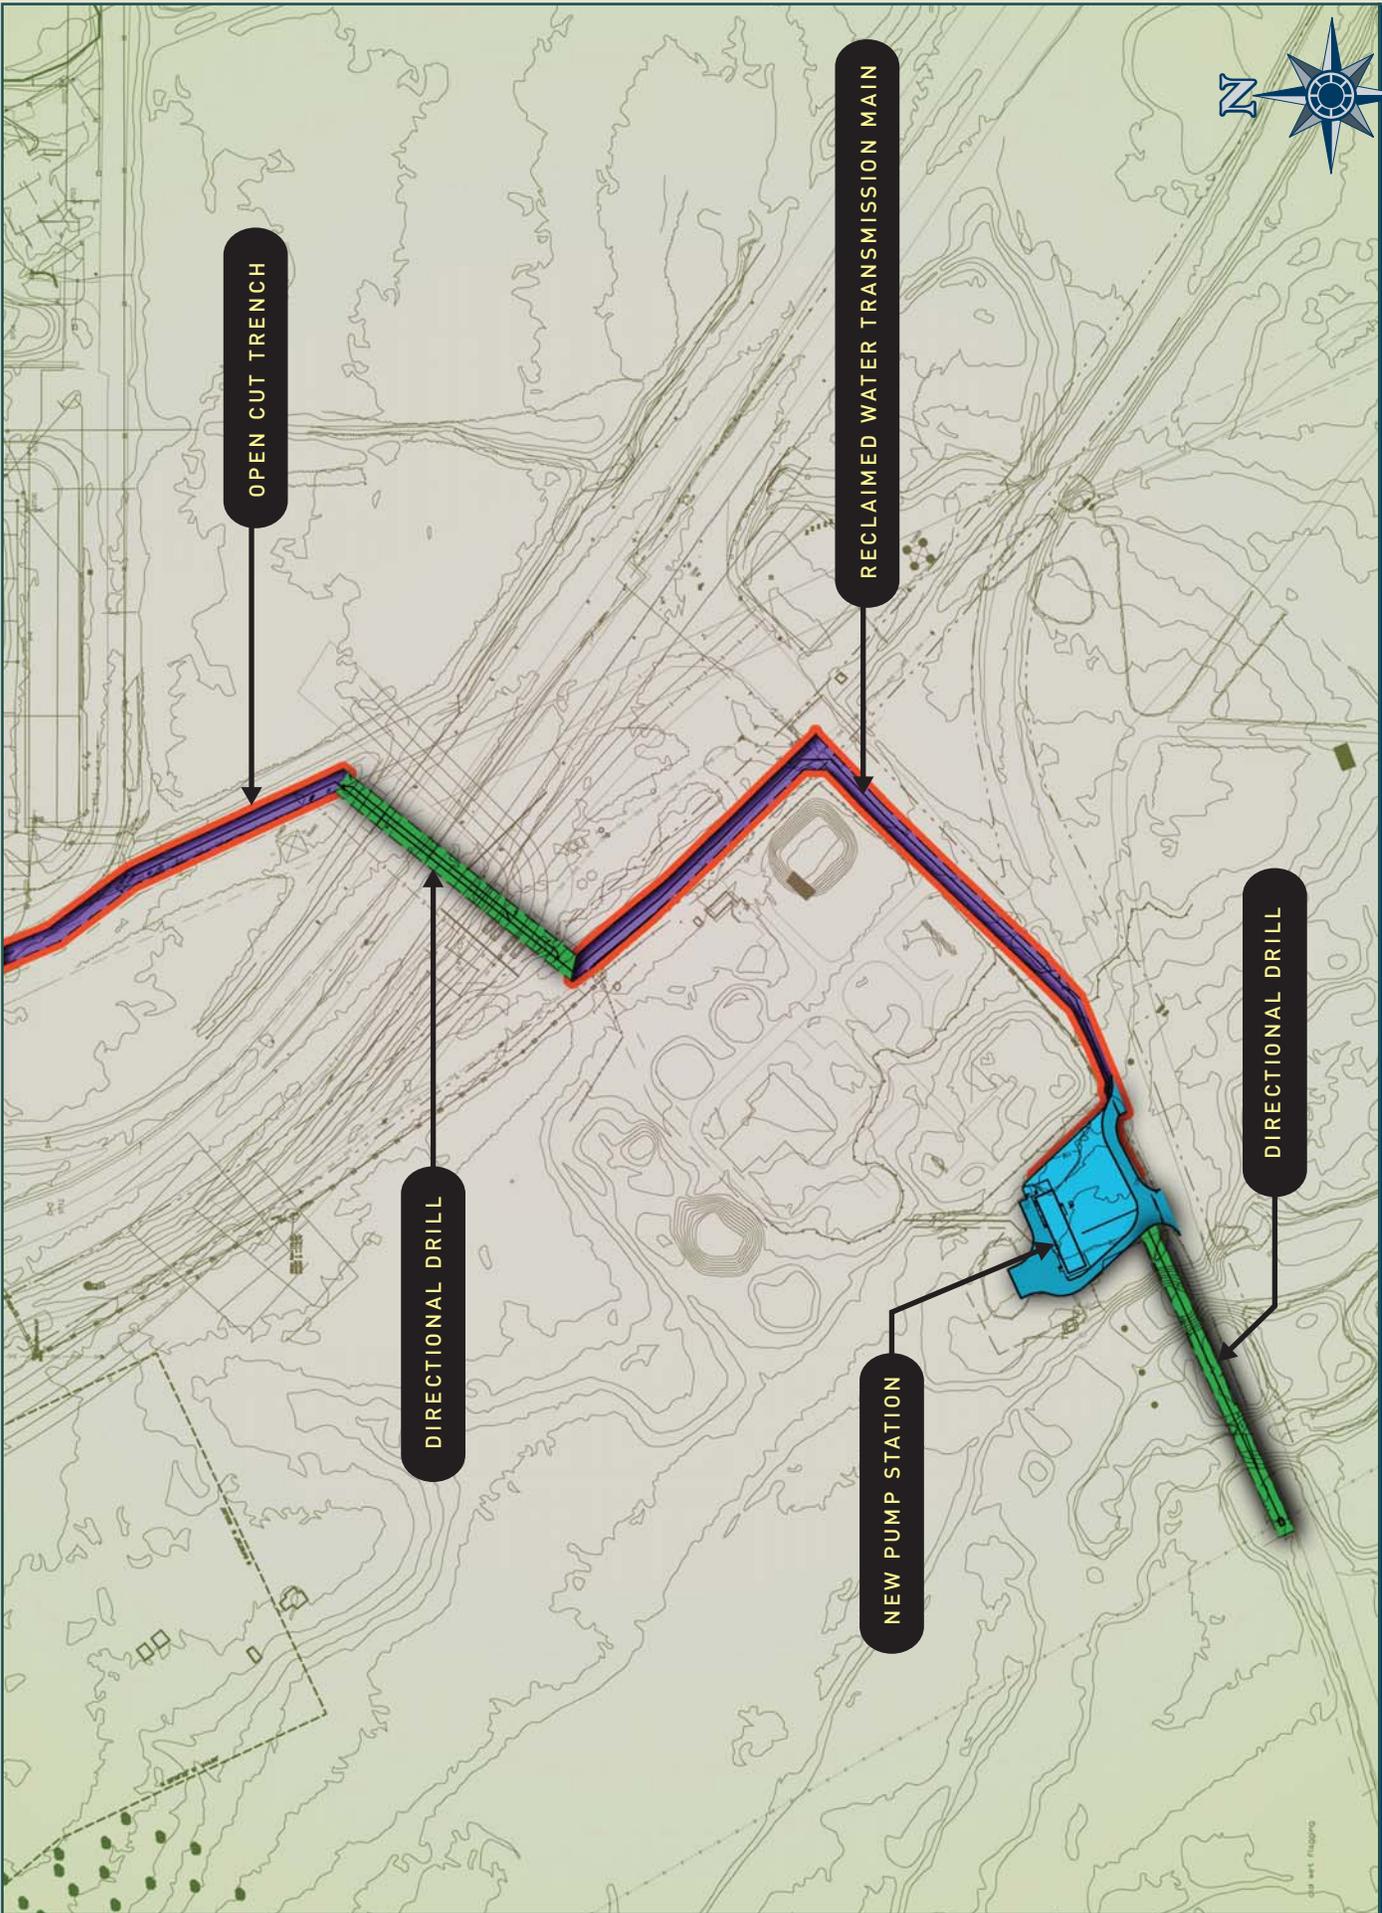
AREAS OF TRENCHLESS PIPE INSTALLATION
